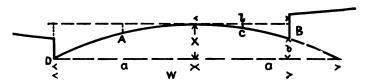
CROSS-SECTION OF PAVEMENT: ONE GUTTER HIGHER THAN THE OTHER.
